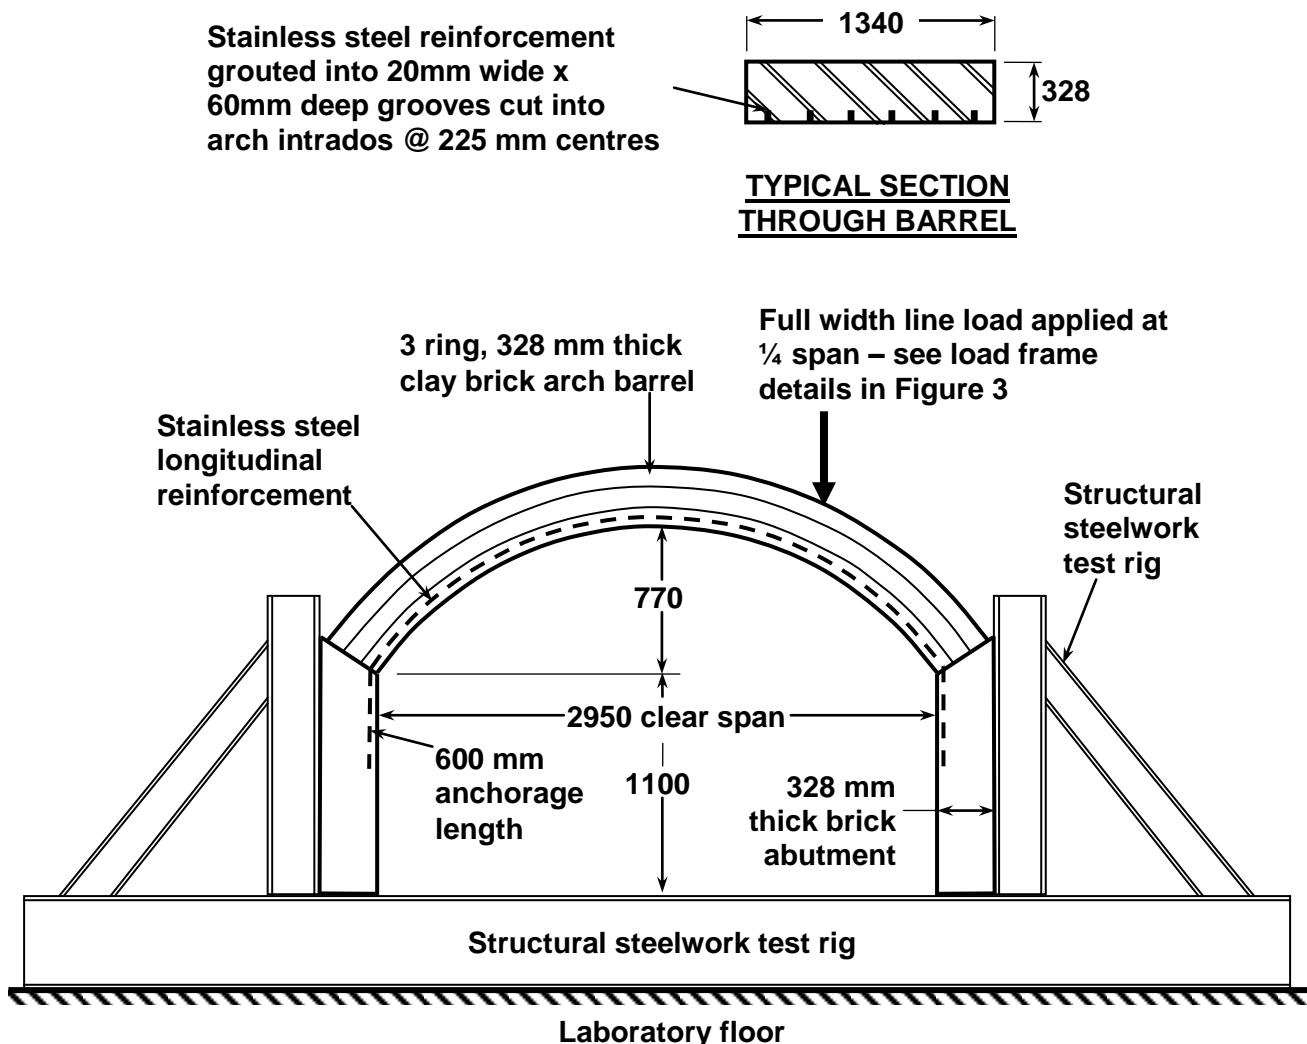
Typical test arch details showing the longitudinal reinforcement (all dimensions are in millimetres)
